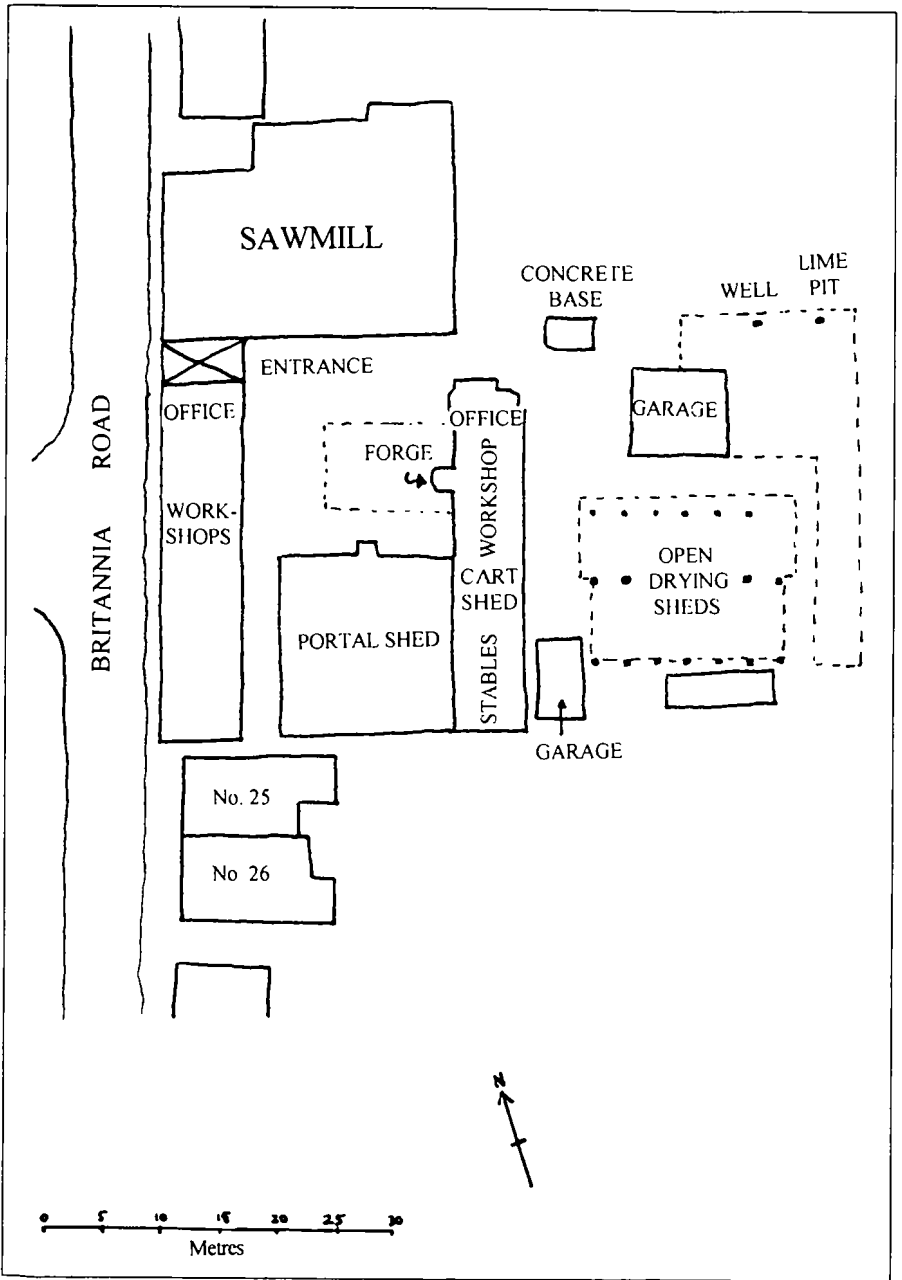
Sketch plan of Kimberley's yard, by Sally Stradling after Phoenix Consulting, based on plan for J.S. Kimberley, c 1900
